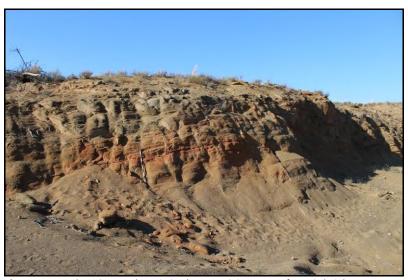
Exposed sections at the existing borrow pit in excess of 3+m in height
